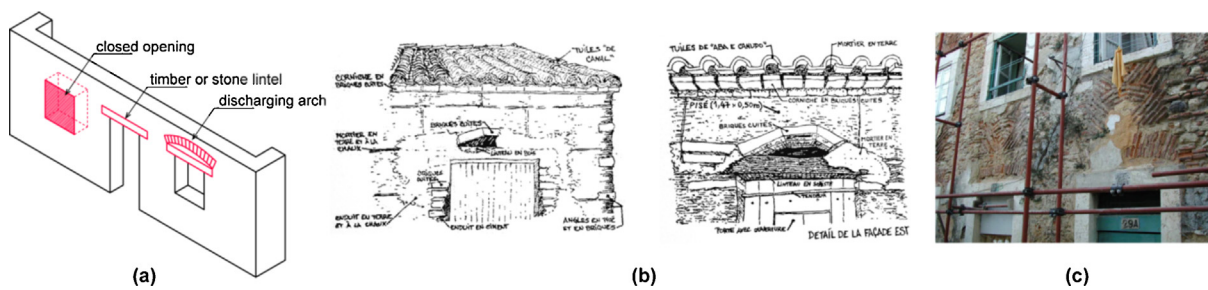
(a) Traditional ways of reinforcing the openings; (b) brick masonry discharging arches and timber lintels used in rammed earth constructions in Alentejo, Portugal [47]; and (c) discharging arch in Lisbon, Portugal [1].
